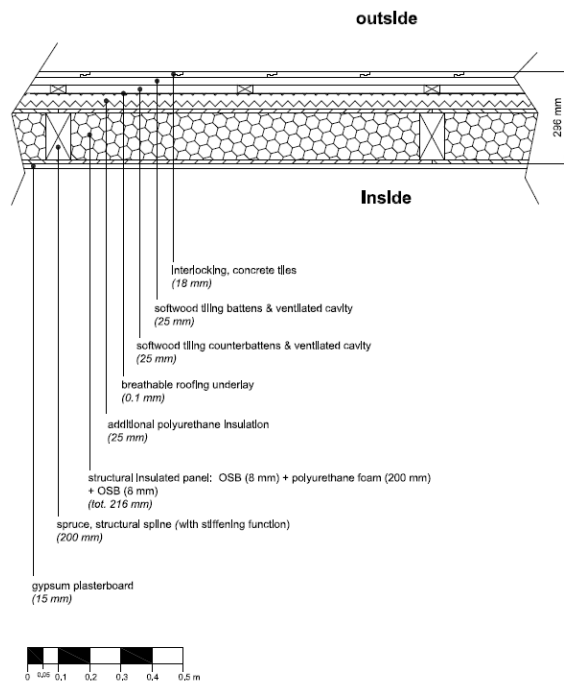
Roof C (structural insulated panels (SIPs)), cross-section.
